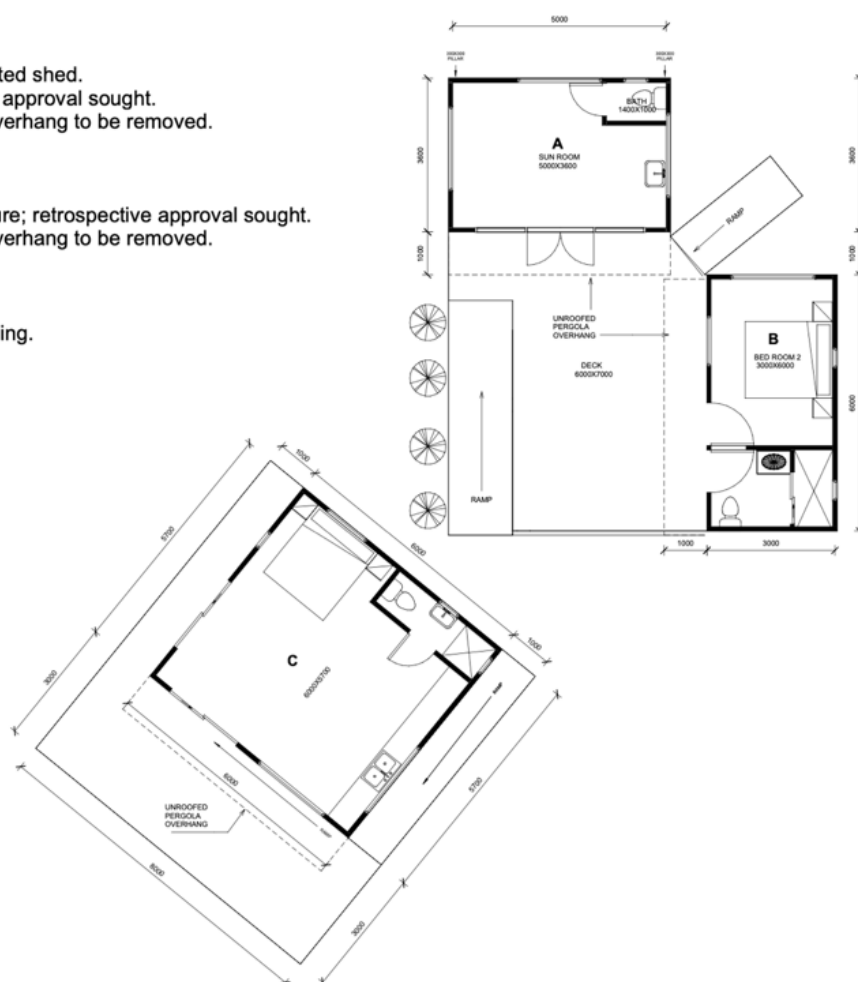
Shack 4 floor plan as supplied showing the various states of approval and construction
